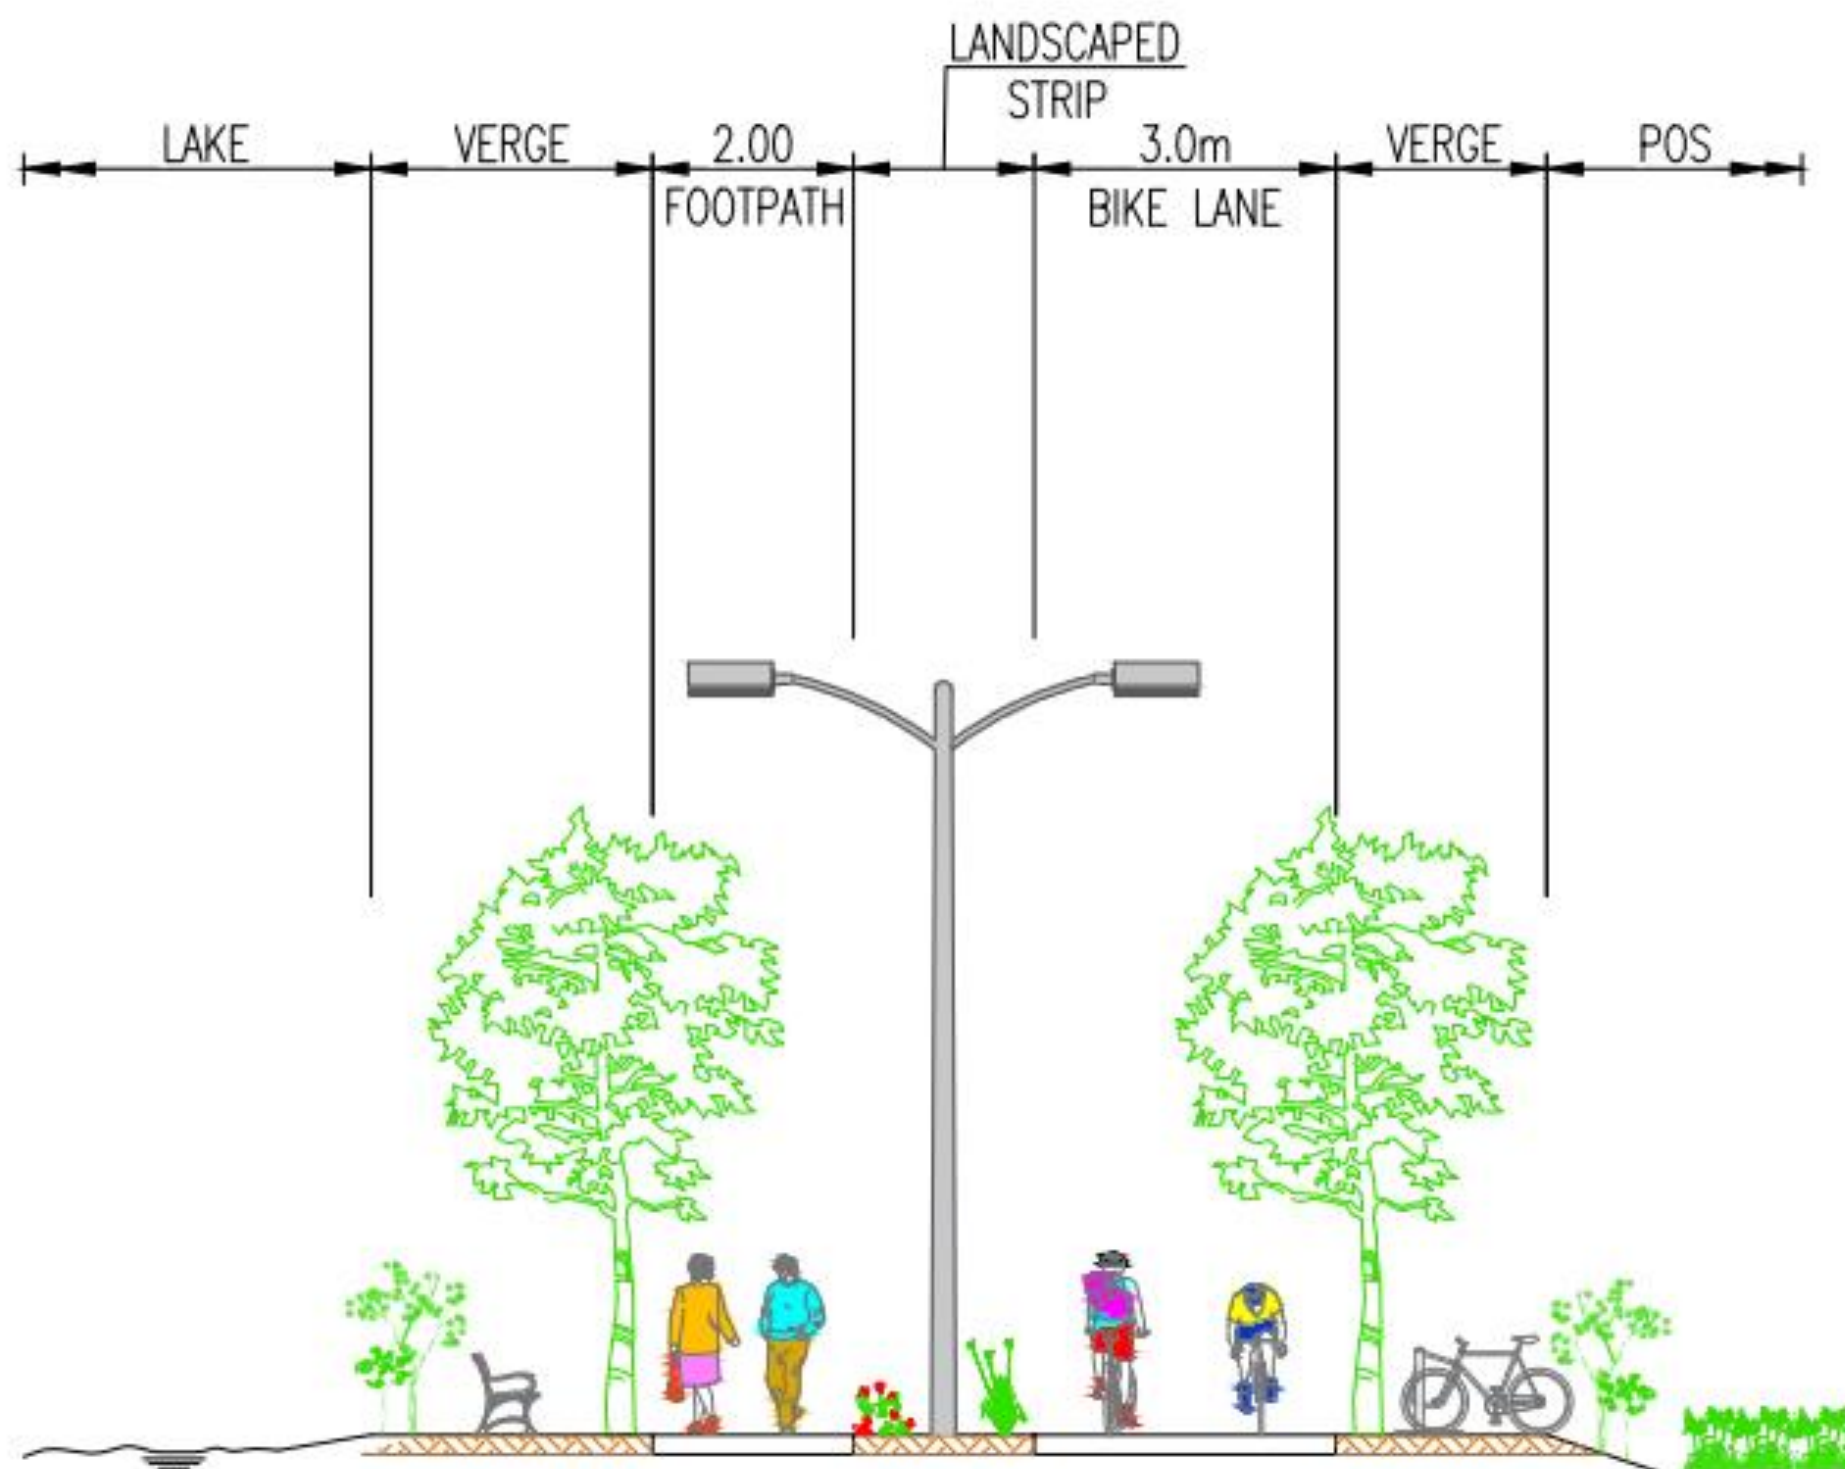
CROSS SECTION LINK ADJOINING A LAKE AND POS
